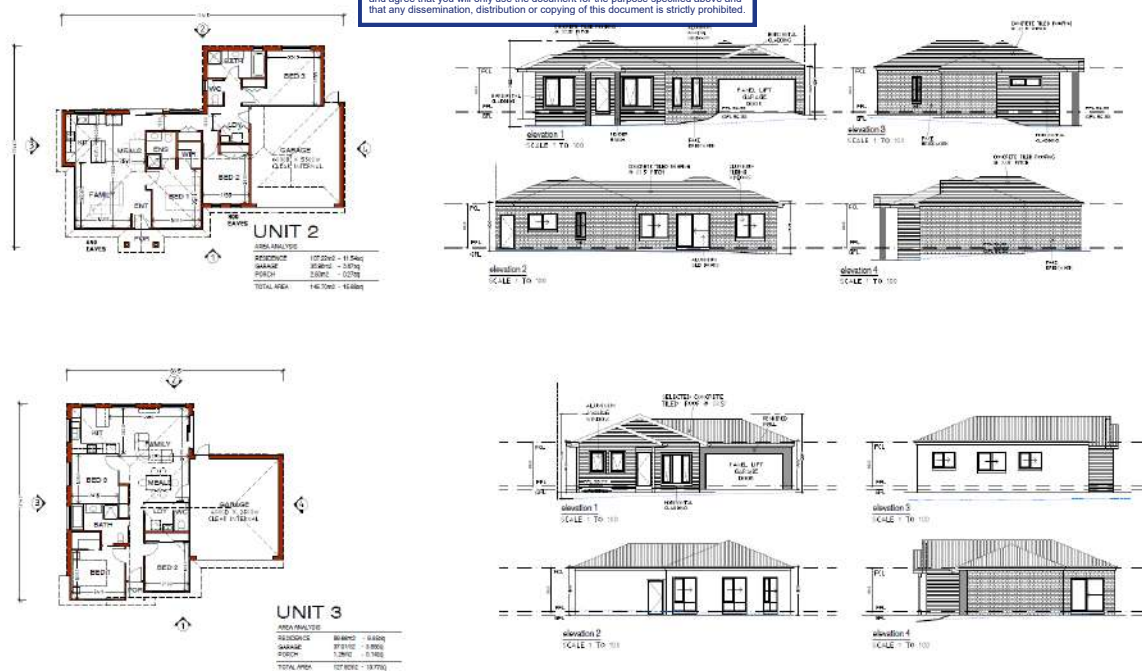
Proposed Unit 2 and 3 Layout and Elevations
